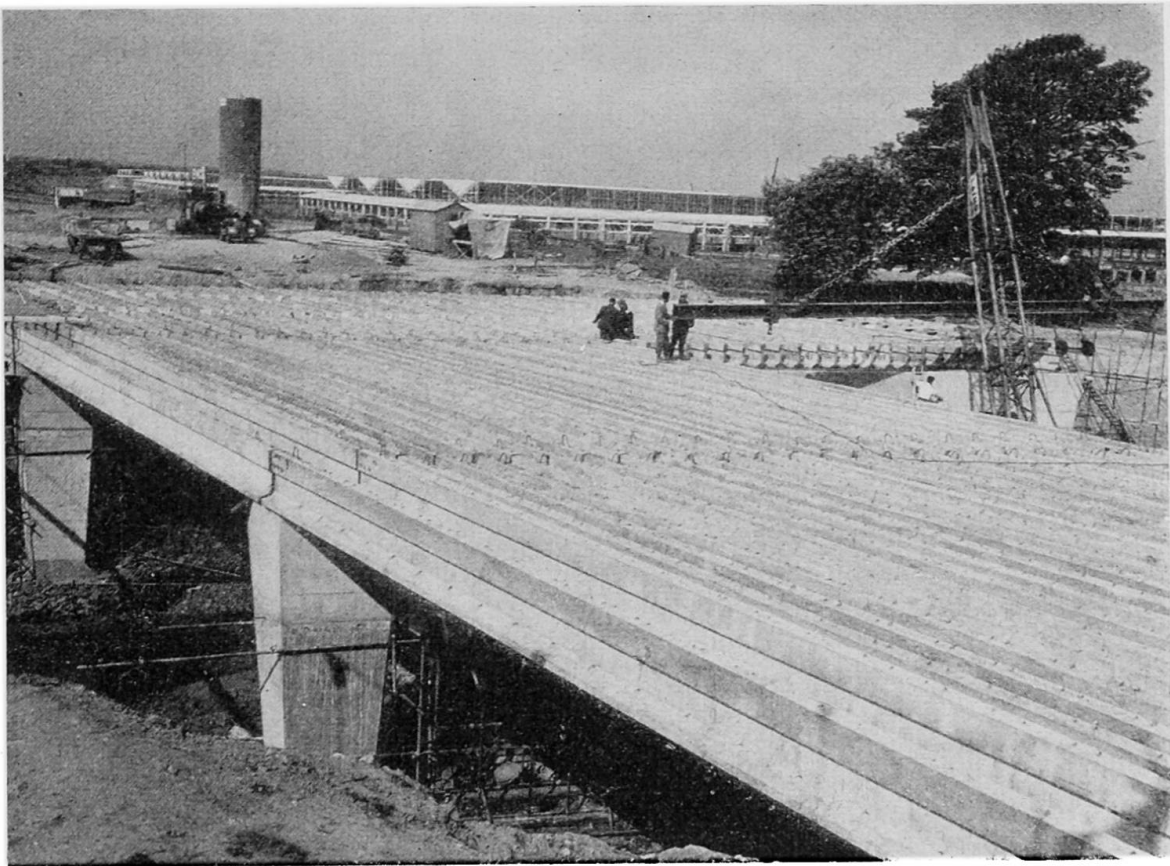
Standard inverted T-section beams for Easter Inch Bridge, Scotland.
